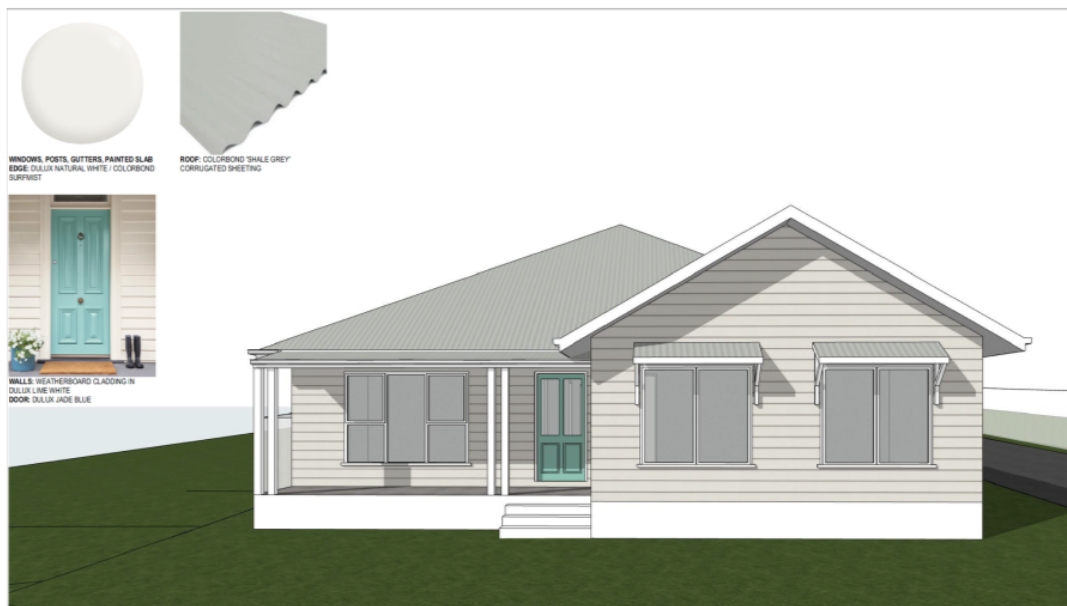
Render of the proposed Lot 1/front infill development with material palette.
